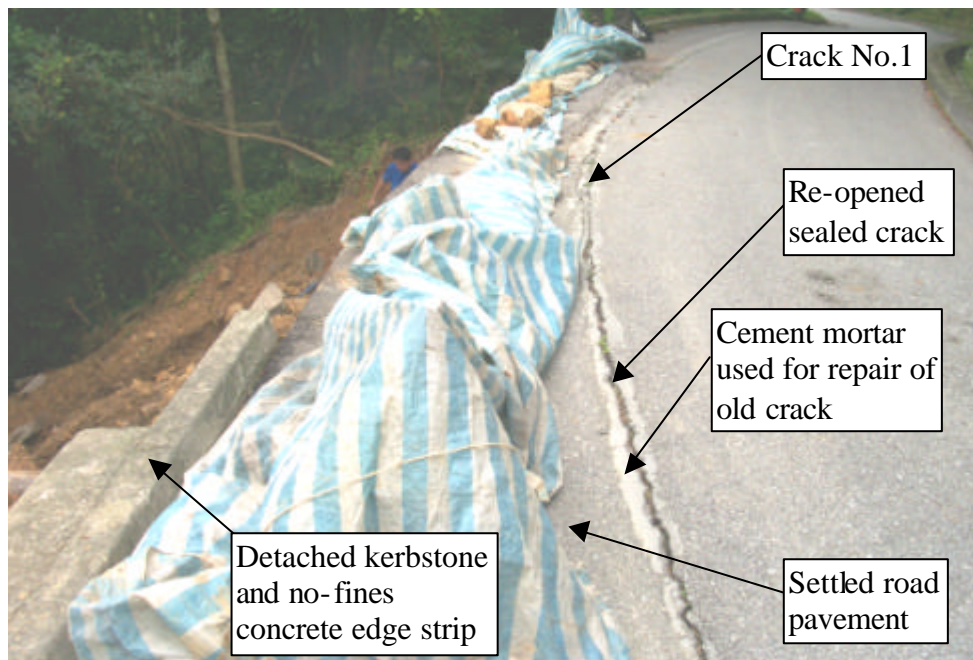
View from Road Showing Re-opened Sealed Crack No.1, Settled Road Pavement, Detached Kerbstone and No-fines Concrete Edge Strip
